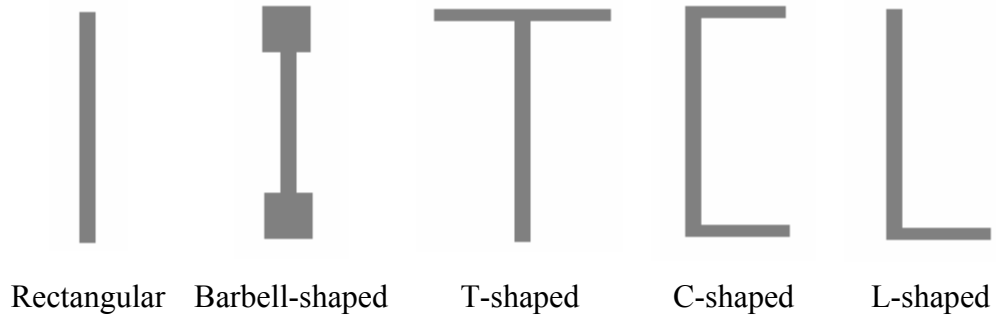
2. Typical Shapes of Structural Wall Cross-sections
